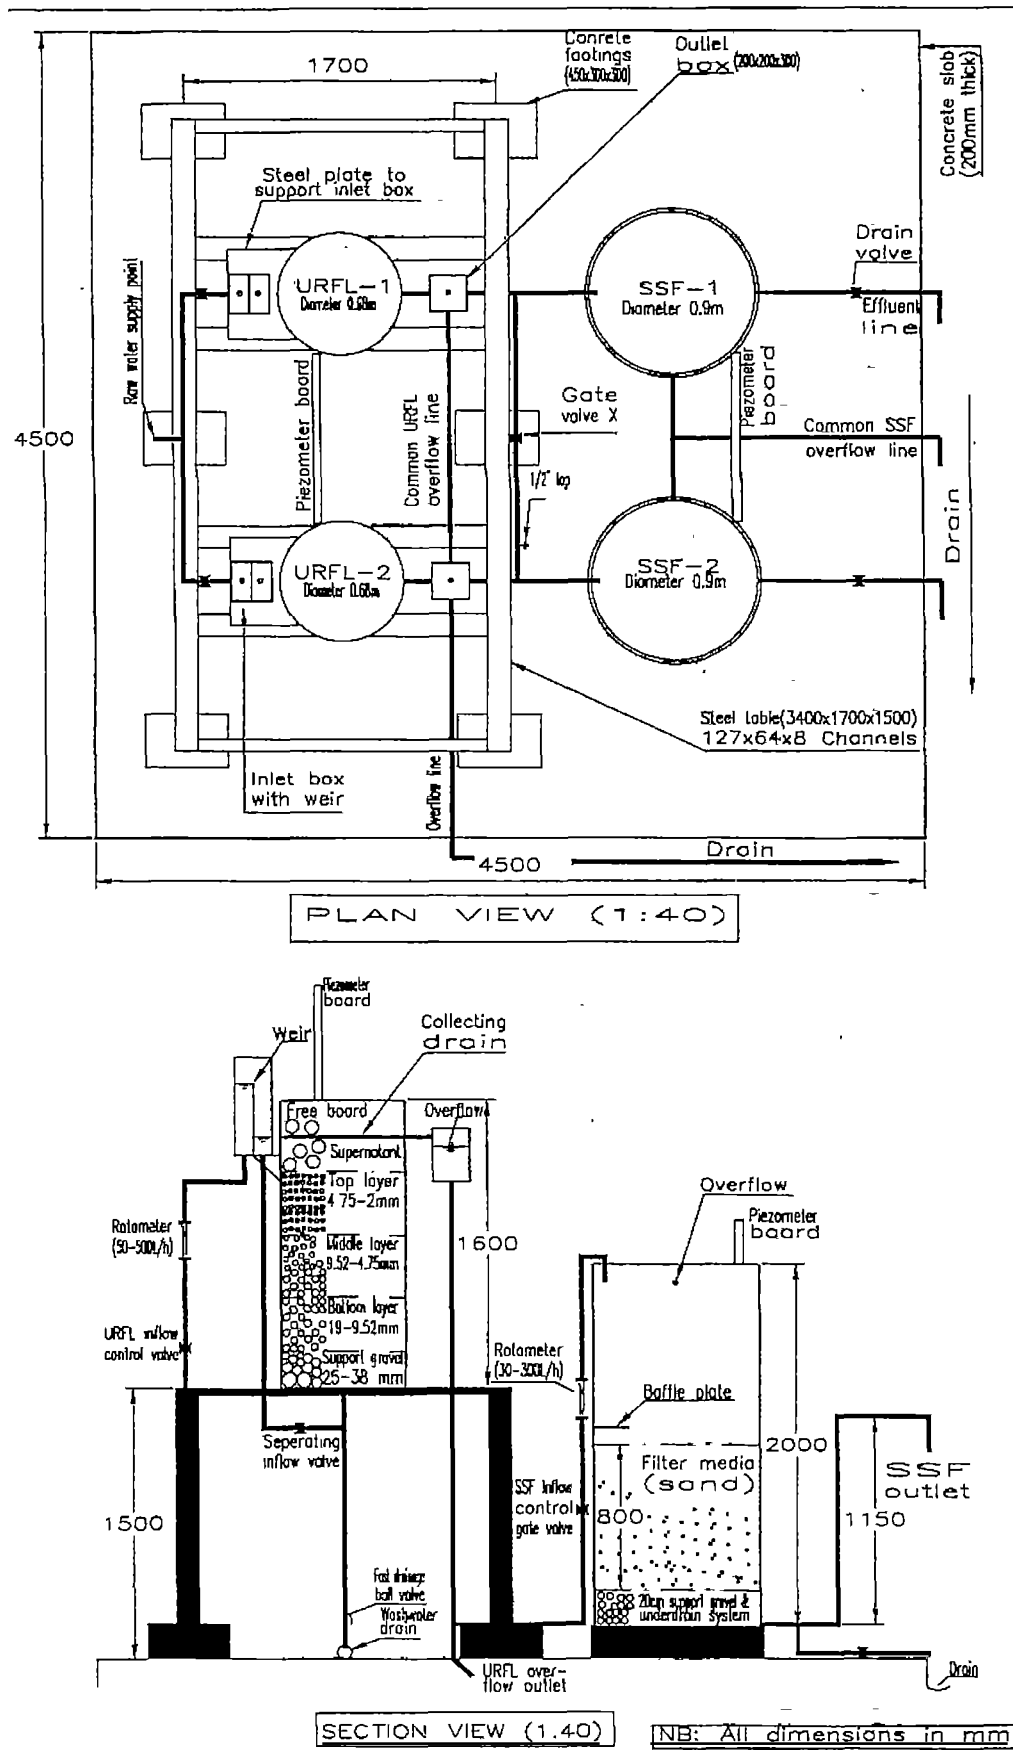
Schematic layout and design of pilot plant Iolanda
